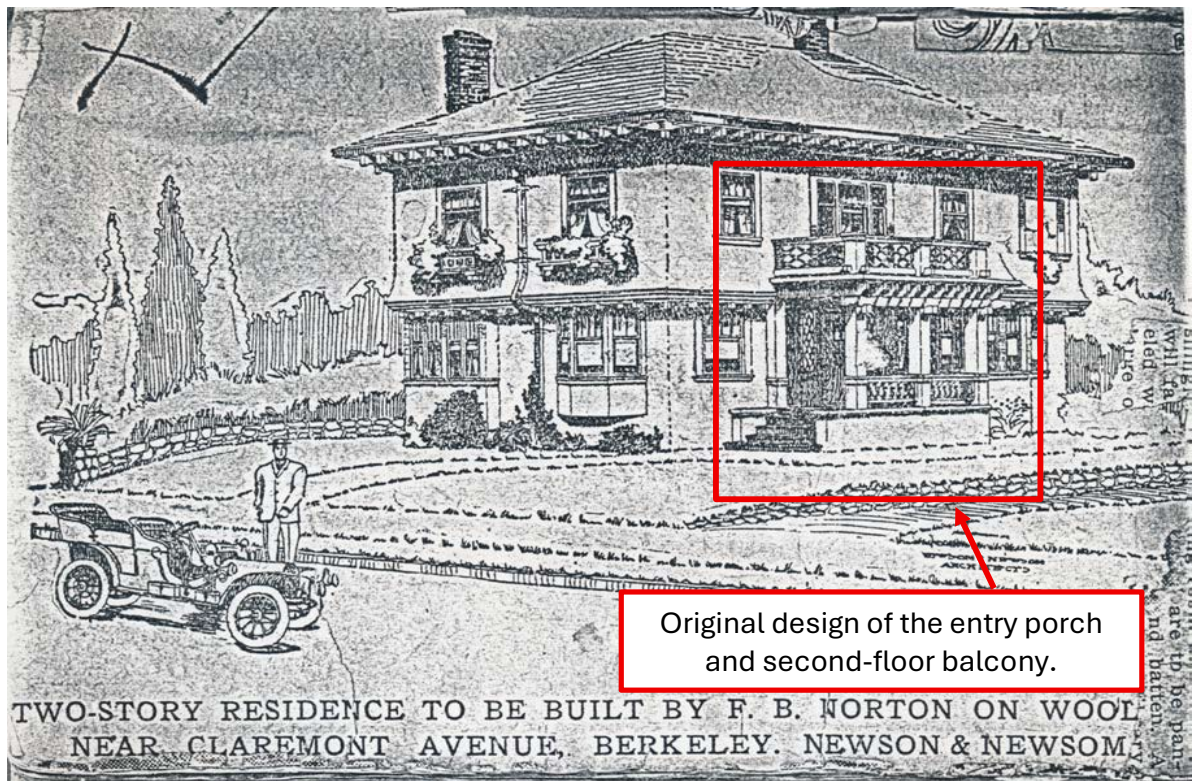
Illustration rendering of F.B. Norton House, 1908 (Oakland Tribune, SAP application packet)
